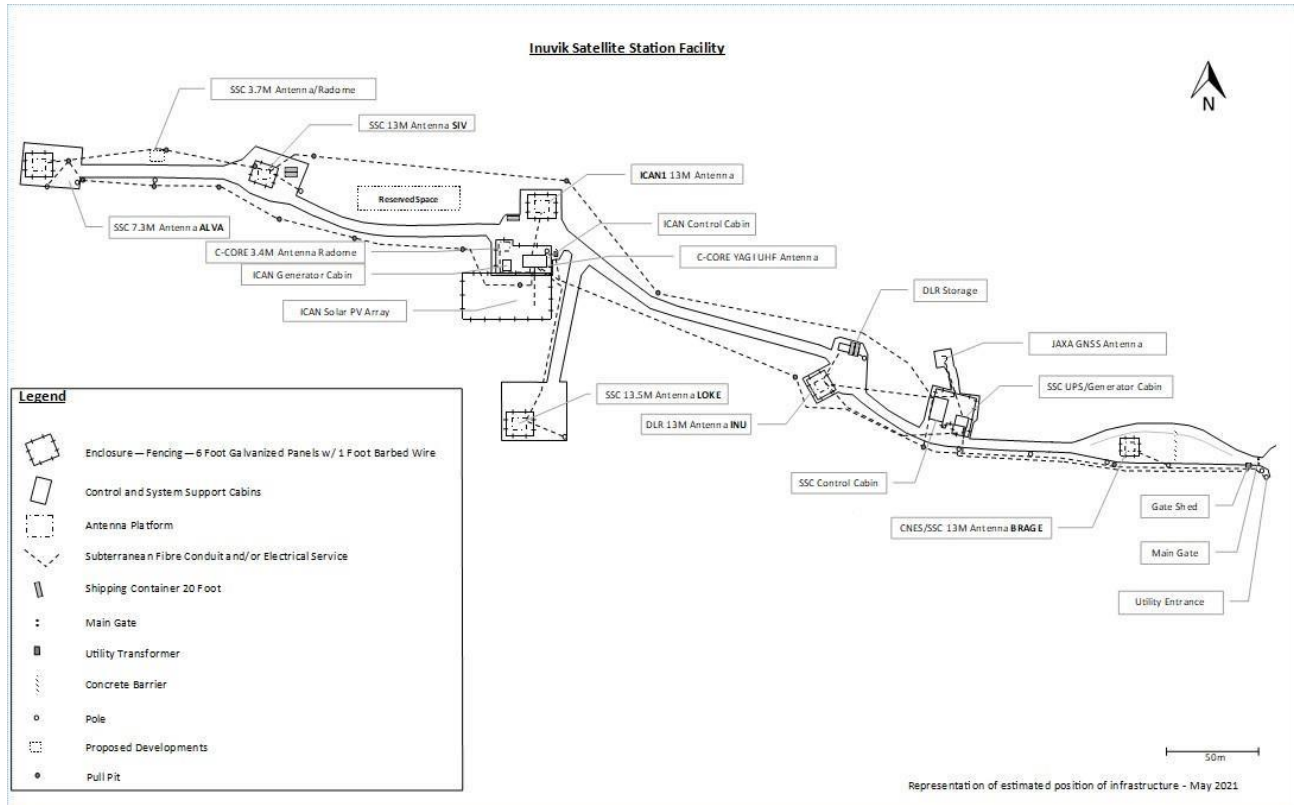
Inuvik Satellite Station Facility Phase 1 & 2 Layout
